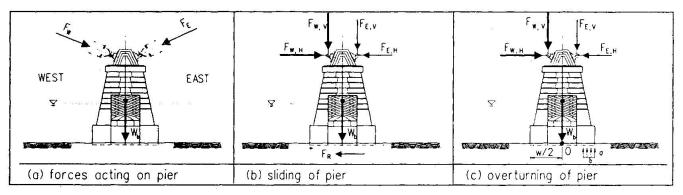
Sliding and Overturning Forces Acting on a Typical Pier
